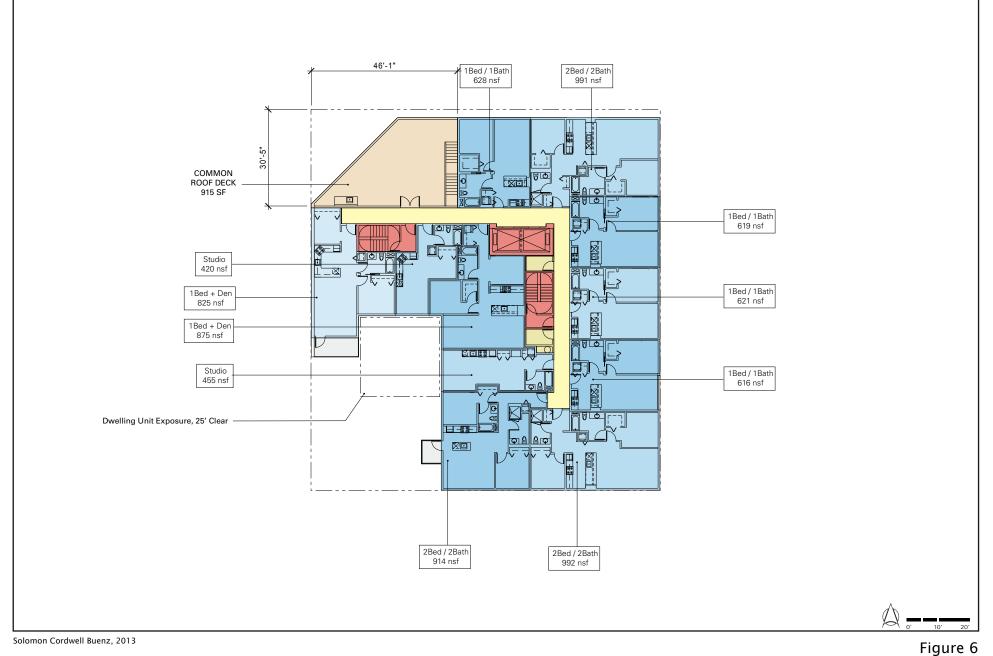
Thirteenth Floor Plan 101 Polk Street, San Francisco
